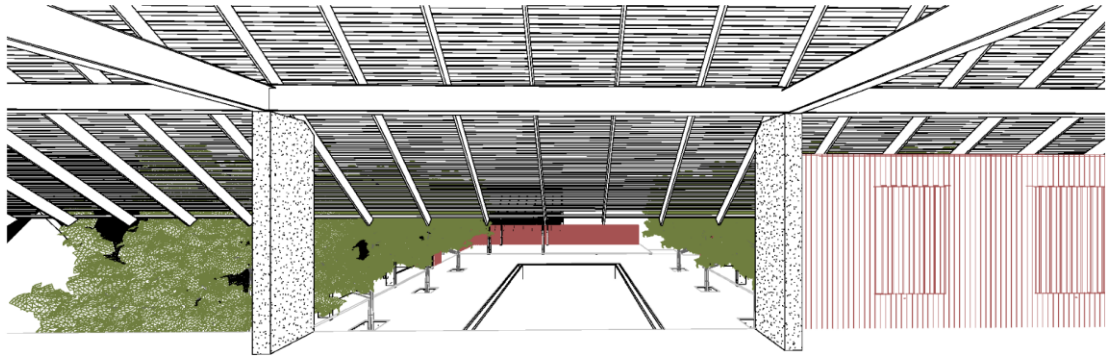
Perspective view second floor under the roof to main floor view, drawn by author.
